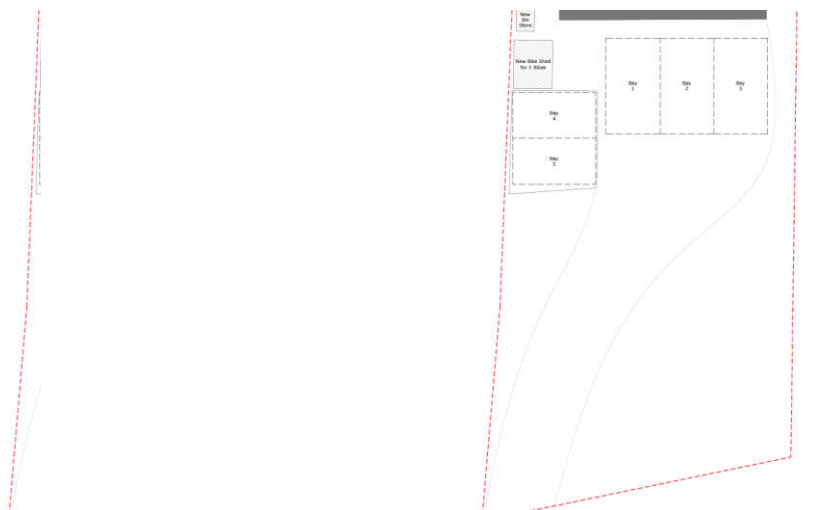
Proposed Car Park Layout Plan (please note – larger version of plan can be found in the Committee Plan Pack)
